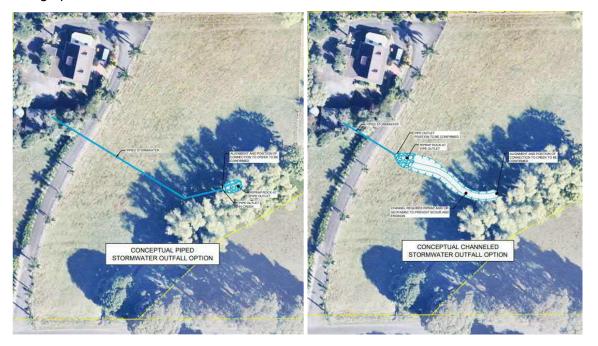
Conceptual piped stormwater outfall option(L) and conceptual channelled stormwater outfall option (R).
